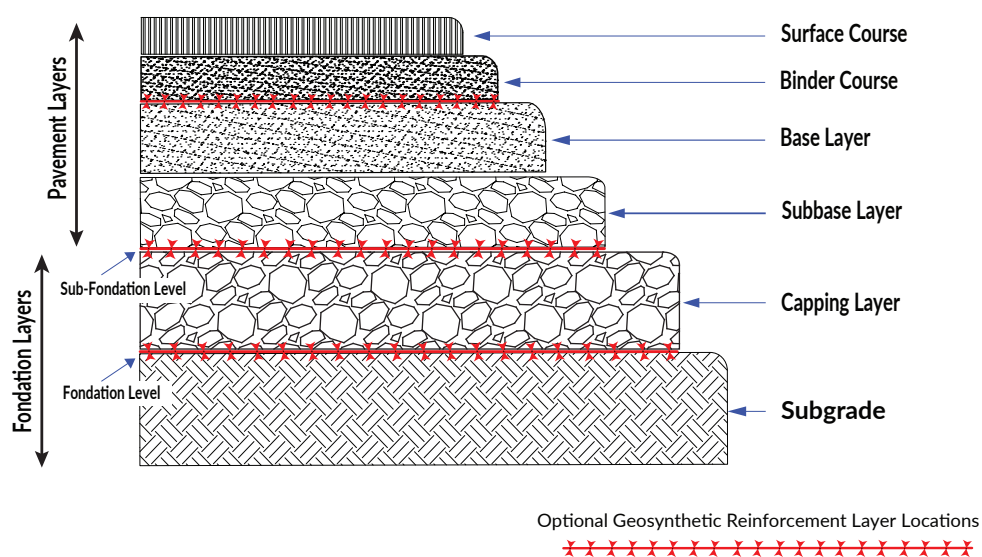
Optimal Reinforcement Locations for Fully Flexible Pavements
